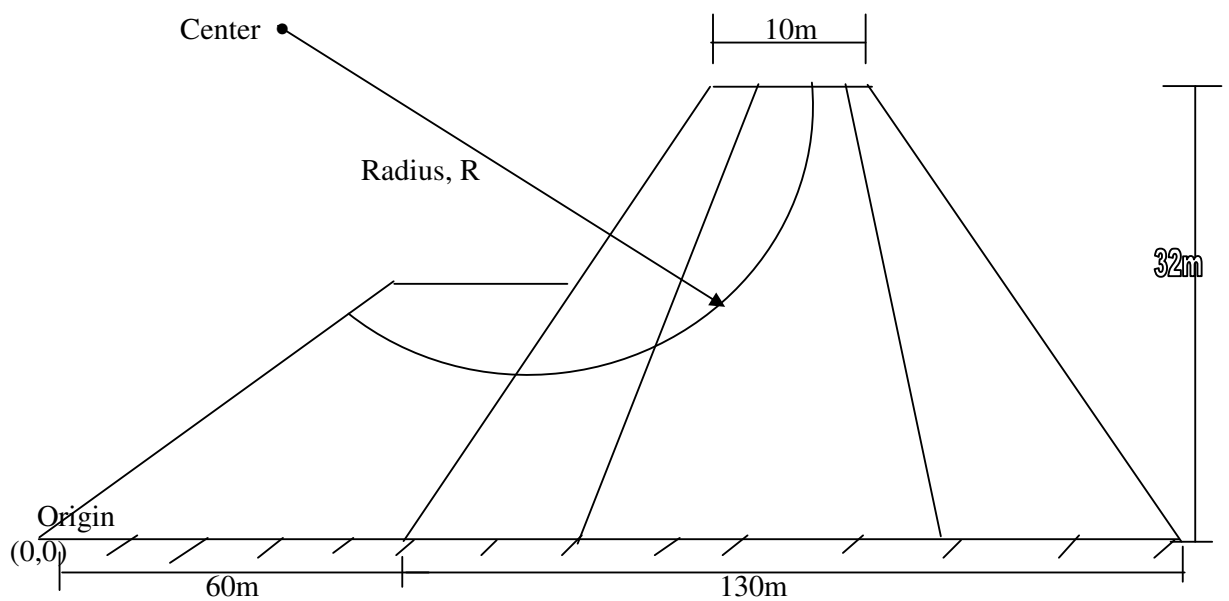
Typical Failure Surface of Sibilu Dam.
